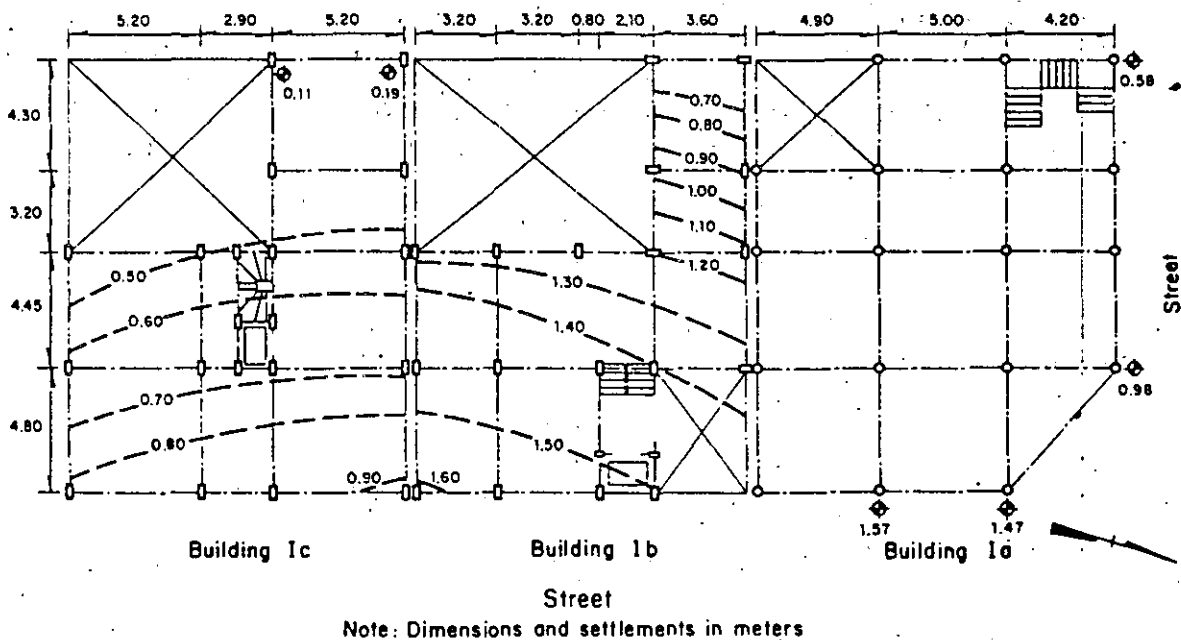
Plan and outline of settlements in three buildings on mat foundation.
